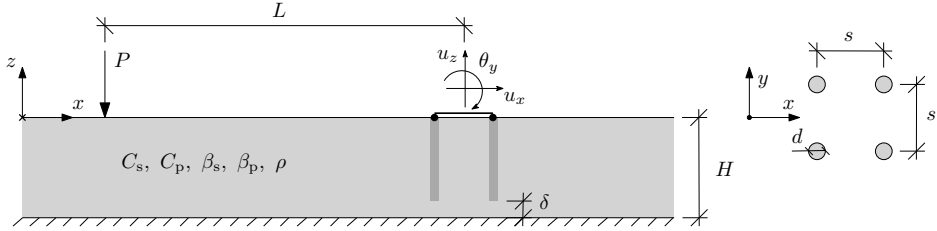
Definition of 2×2 pile group geometry in section (left) and planar (right) view.
